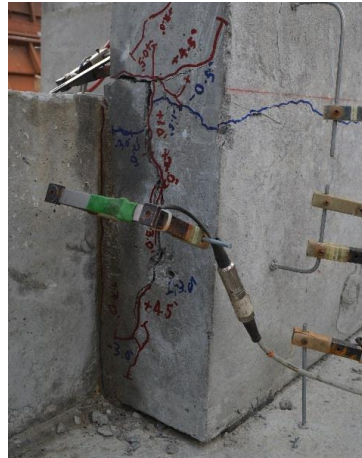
Joint damage to shallowly embedded threaded insert connection (Panel TI12-C42)
